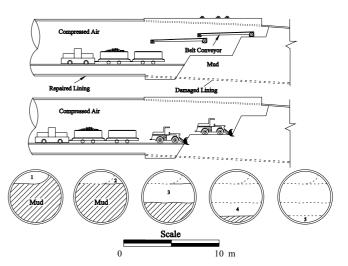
Sequence of re-excavation in damaged tunnel
